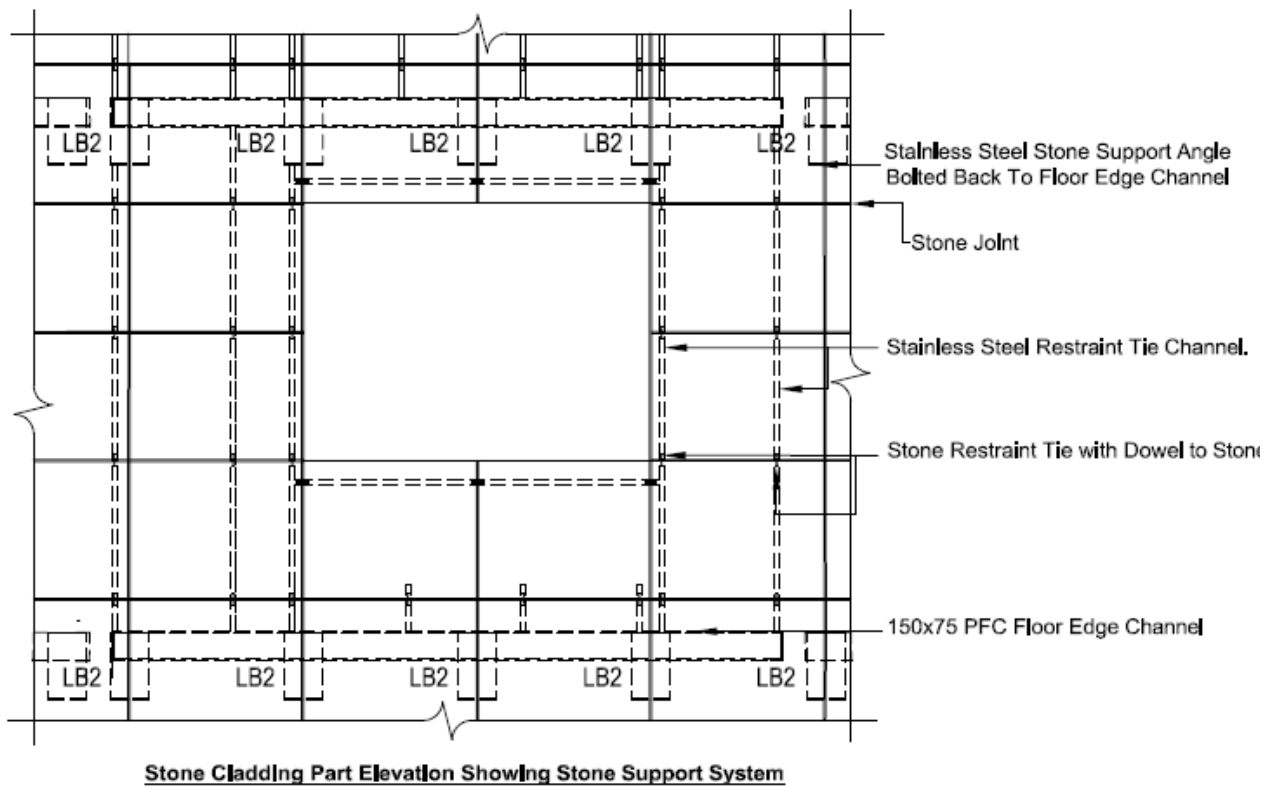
, Stone Cladding Part Elevation Showing Stone Support System
